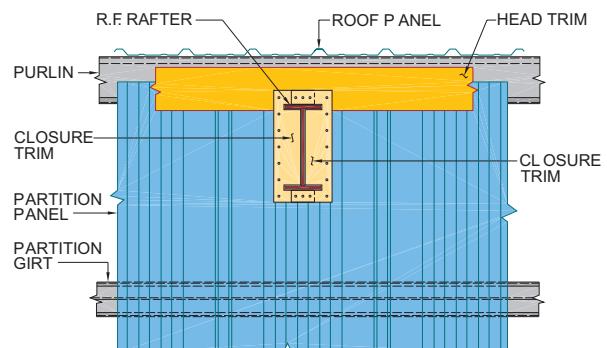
DETAIL-H : PURPIN FLASHING AT PARTITION WALL
